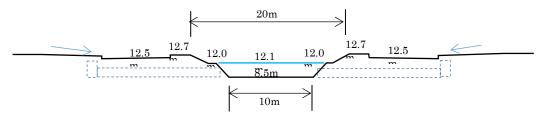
(4)-5 Plan for the Nayanpur main road canal
